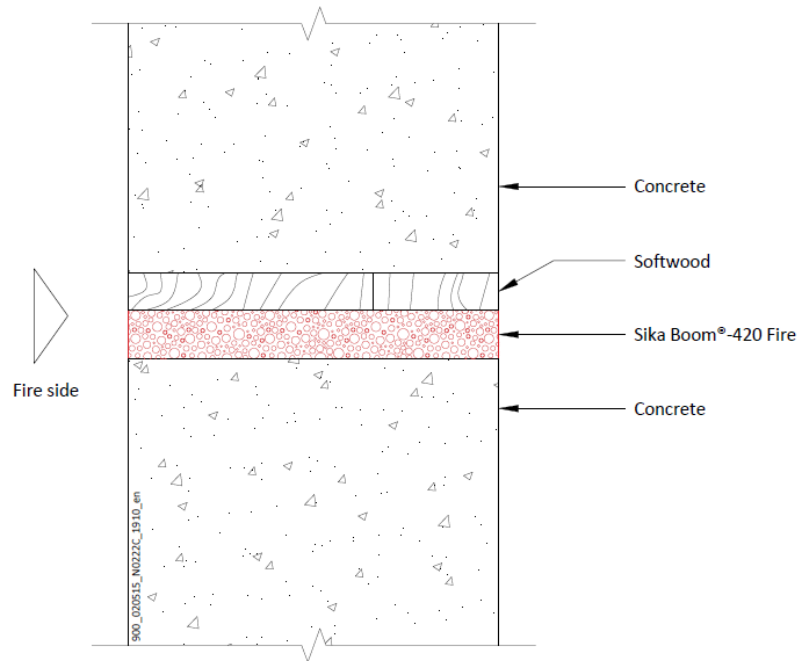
Installation on concrete wall 150mm thick with 15mm softwood insert at one side
